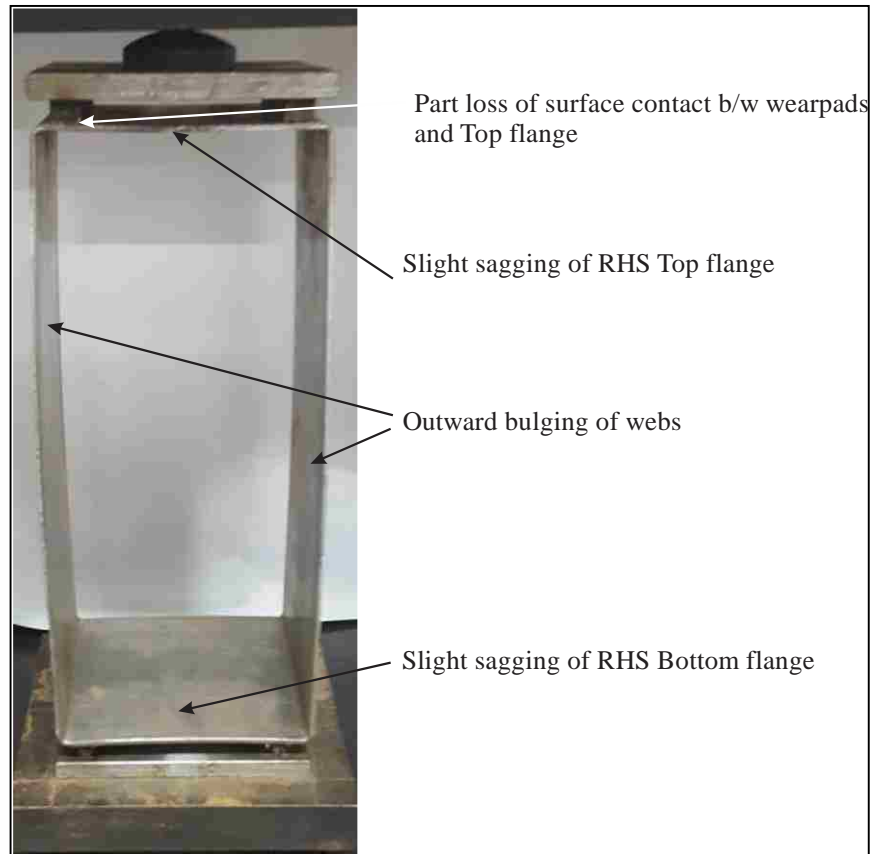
Initiation of flange bending and web bulging of RHS piece between wearpads
